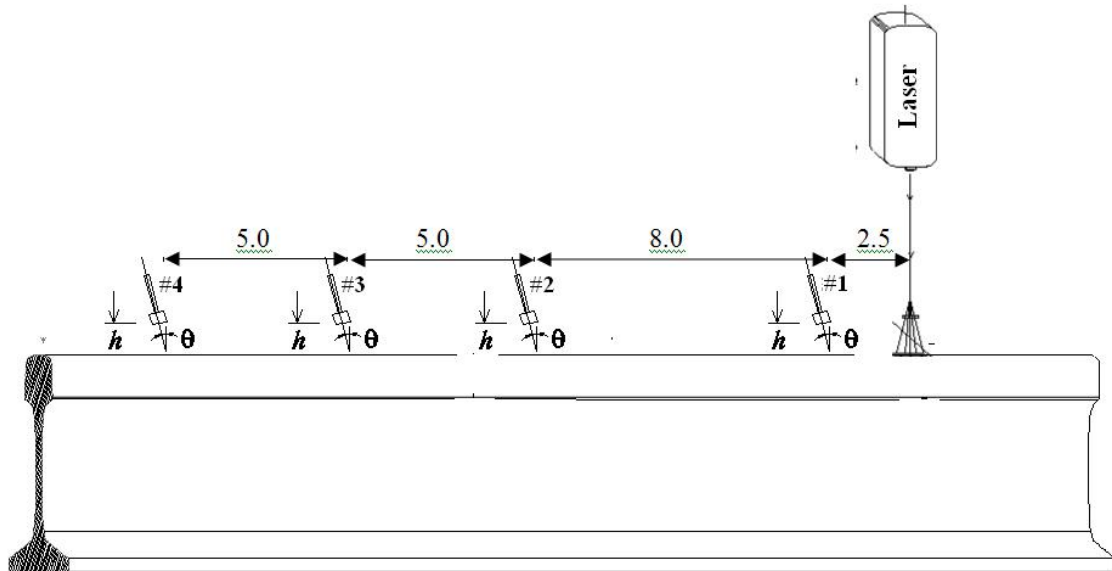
Laser/air-coupled sensor layout for the field test. Dimension in inches. Drawing not to scale
